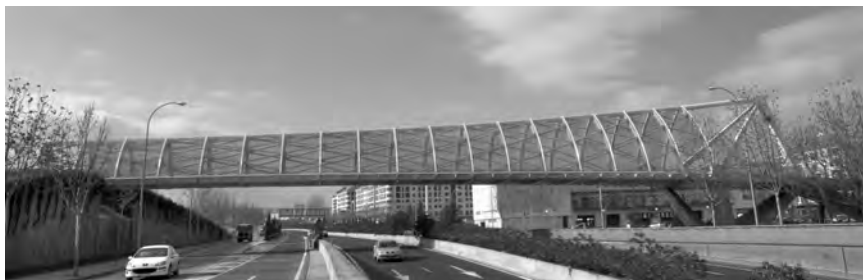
Elevation view of the finished La Cava footbridge (Logroño)
